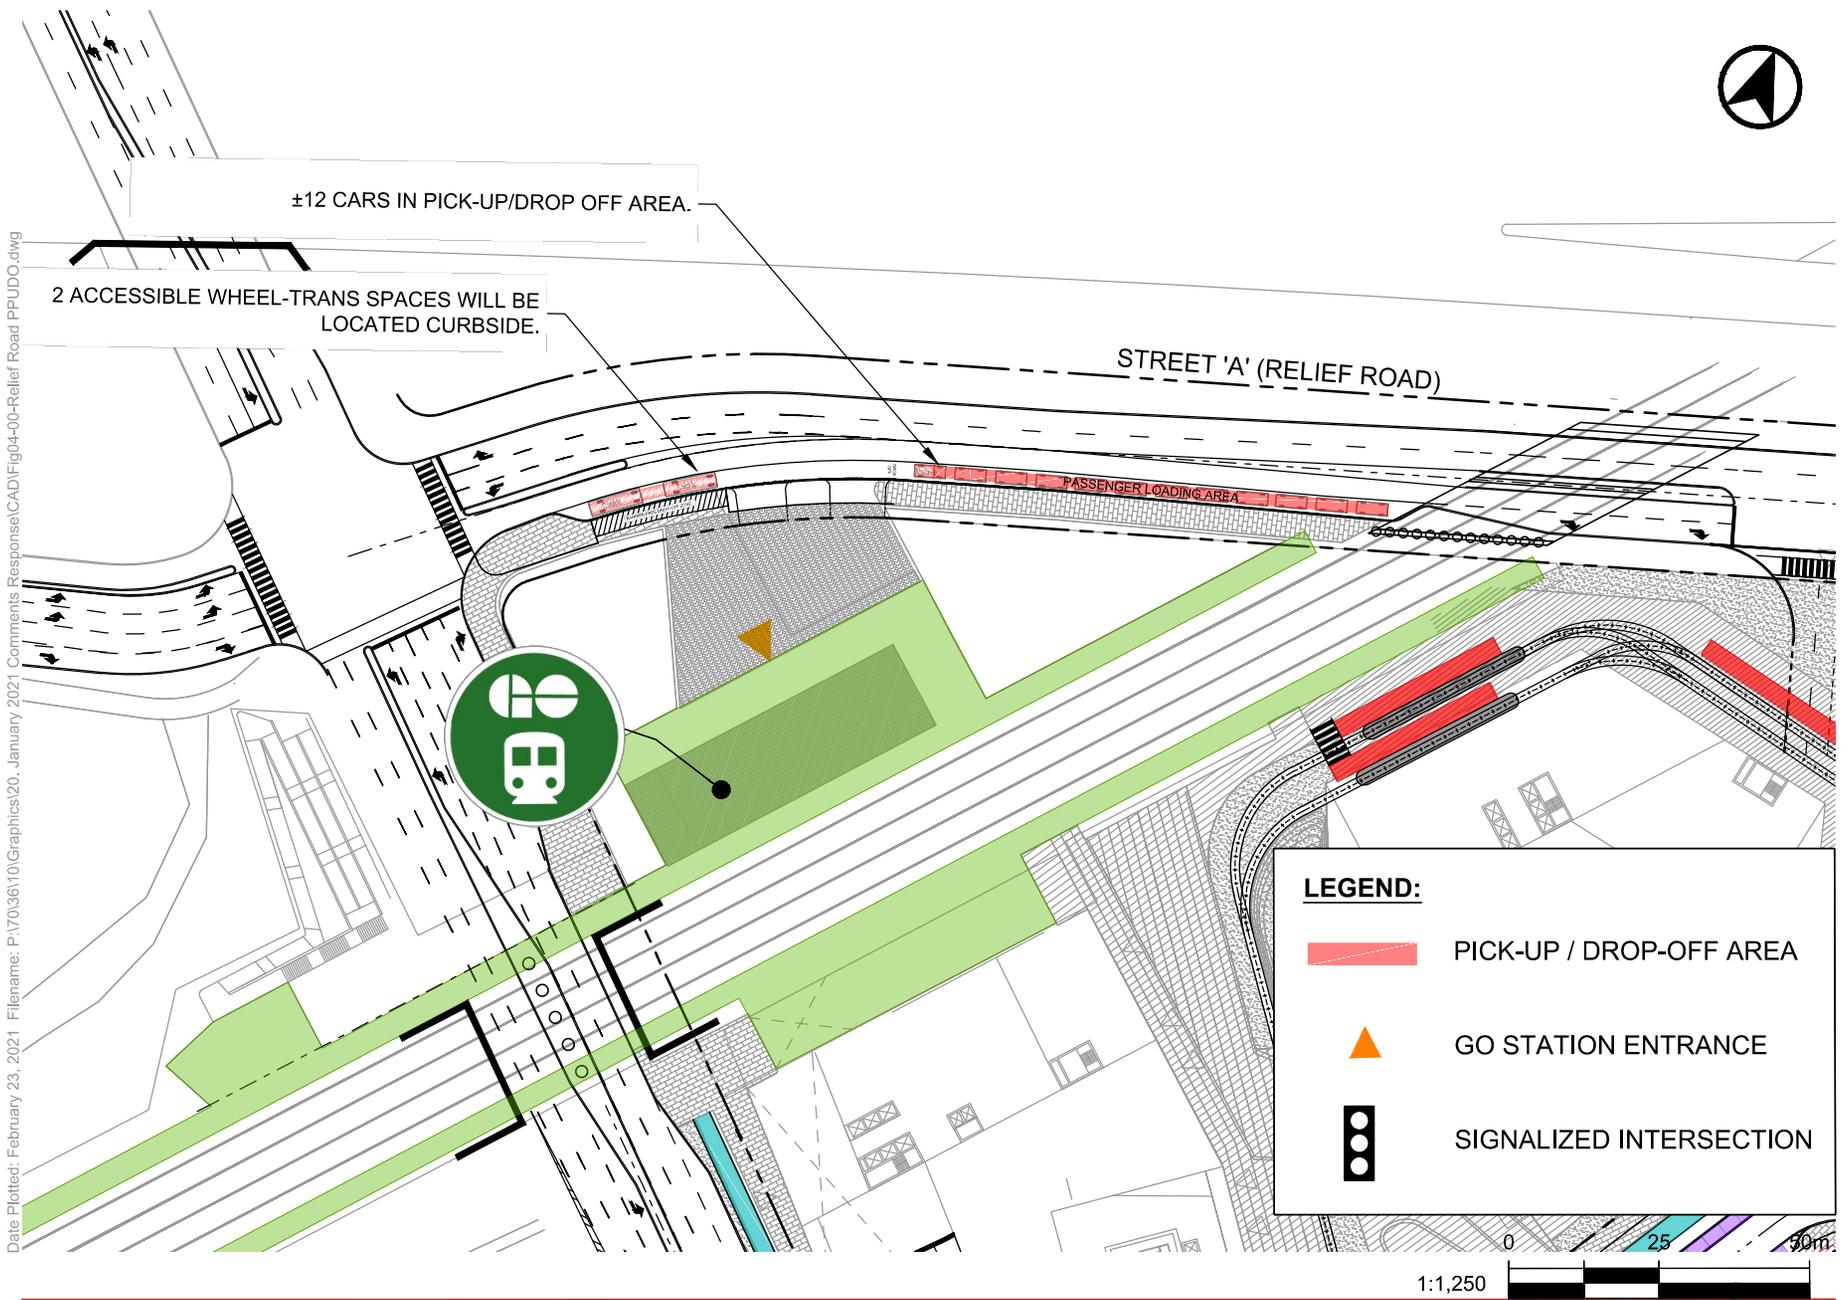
RELIEF ROAD PICK-UP / DROP-OFF ARRANGEMENTS
